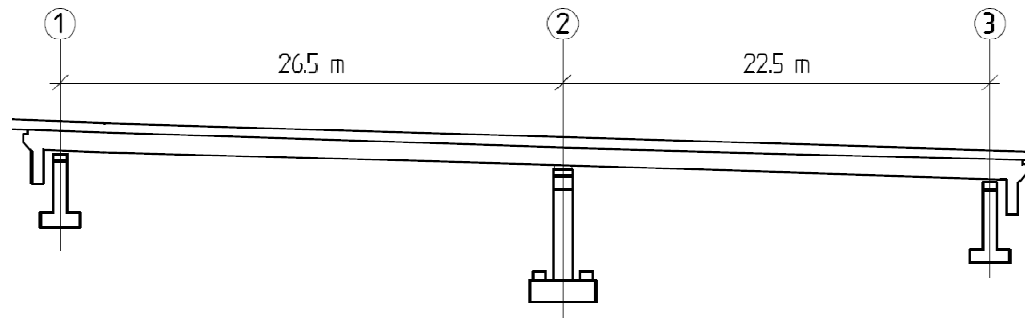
Elevation of bridge P1514 at Brämhult over road 40. Adapted from Batman (2010).
